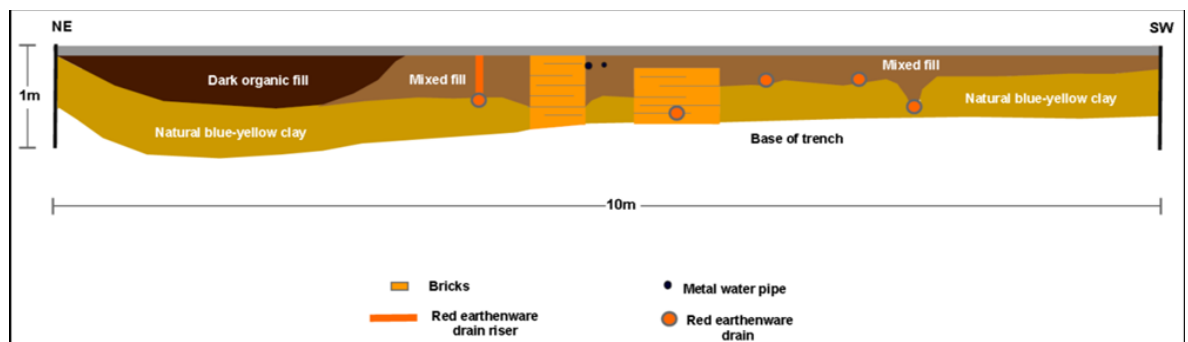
Area 3 trenching for retaining wall cross-section A view (see Figure 1.1), SE baulk (63-65 Martin Square)
